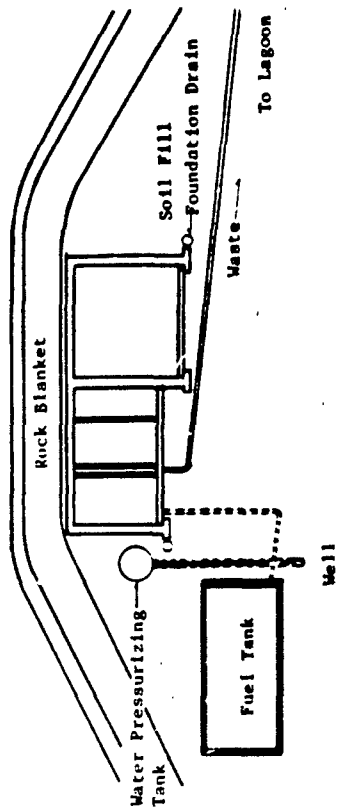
SECTION--MOUND CONSTRUCTION.
